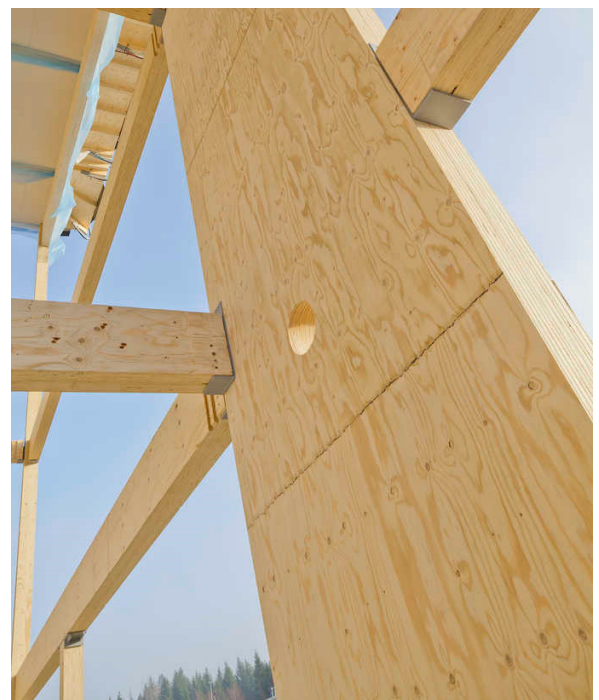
Multiple glued Kerto-Q bracing column in a multi-storey building.
